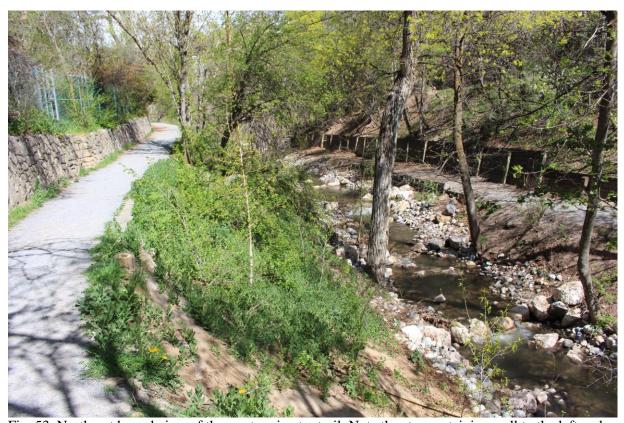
Northeast bound view of the west perimeter trail. Note the stone retaining wall to the left and east perimeter trail and timber retaining wall to the right across from Red Butte Creek (JoEllen Grandy, 4/11/16).
